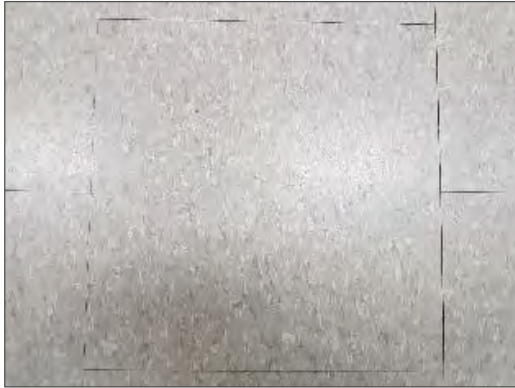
Grey with white and dark-grey speckled floor tile present throughout the assessed area.
